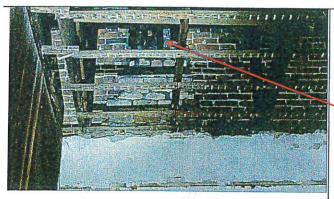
| Grid 3 Inverted King Post Truss Bearing at North Wall.
